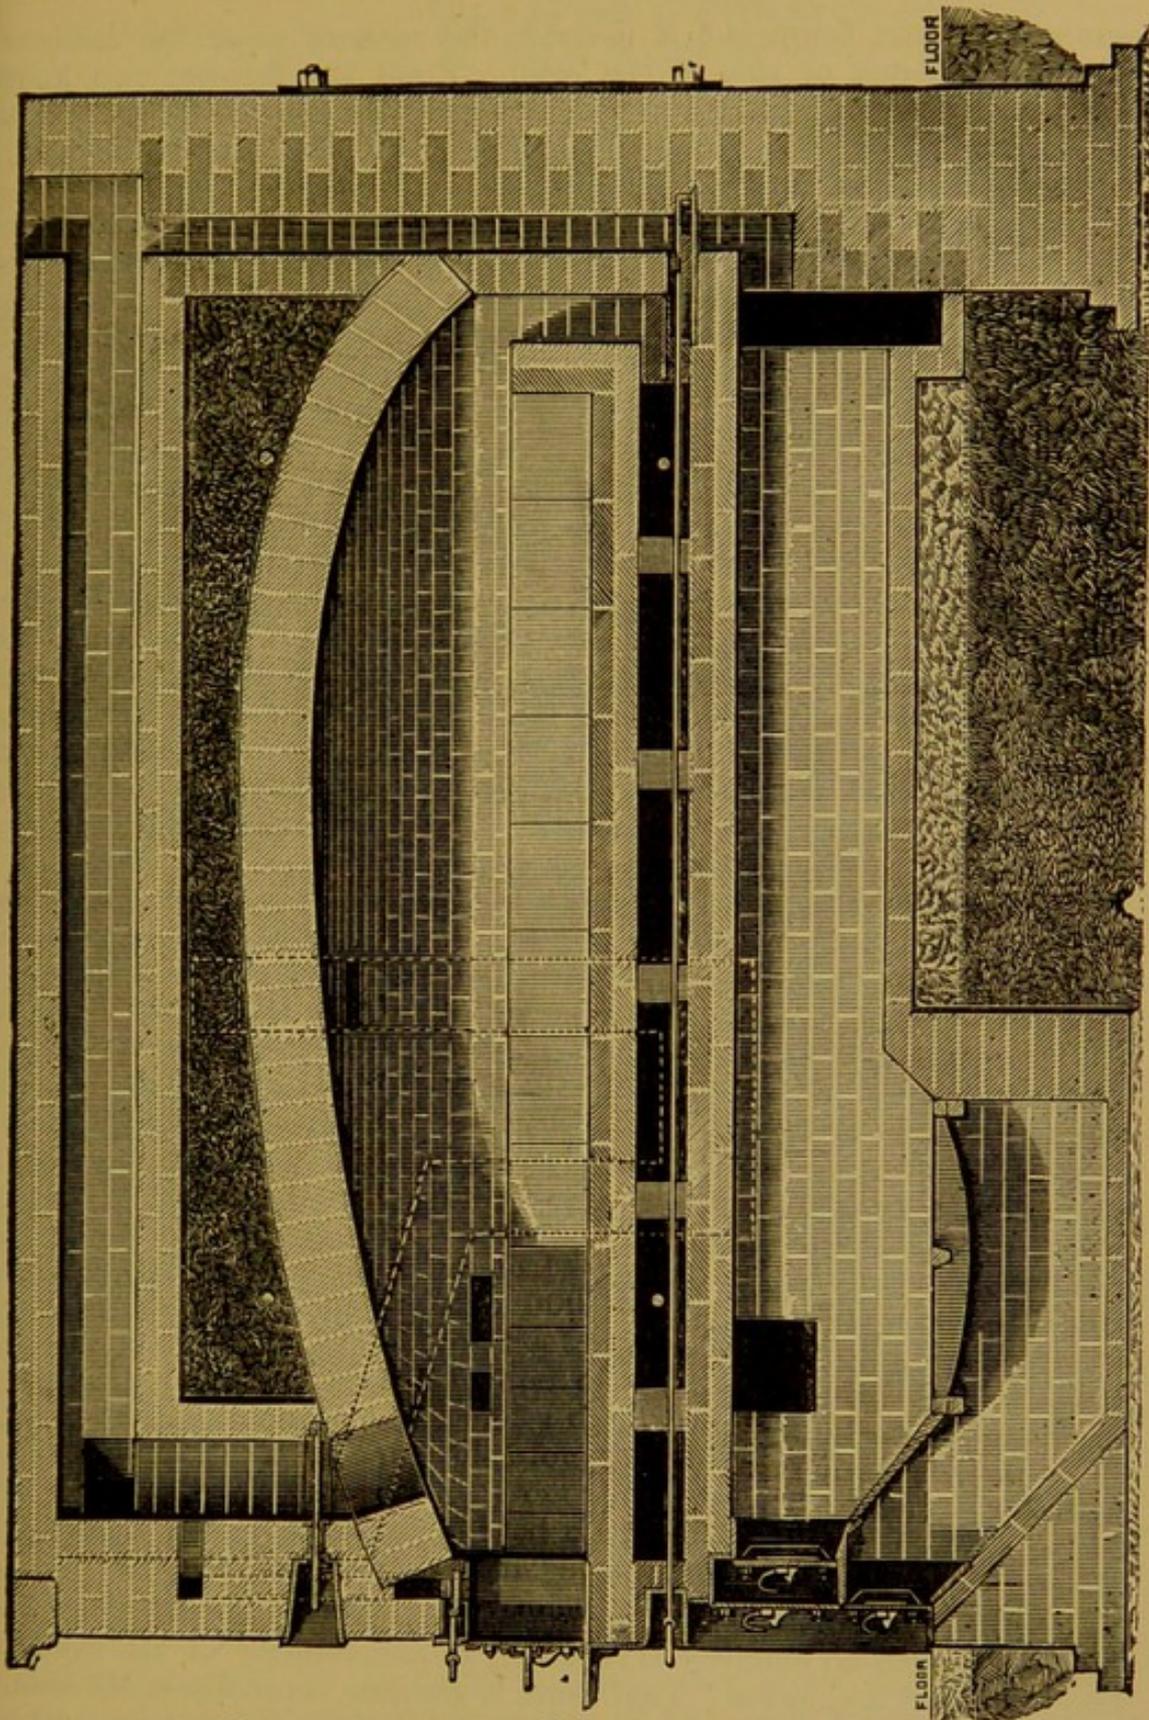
BAILEY-BAKER OVEN, LONGITUDINAL SECTION.
